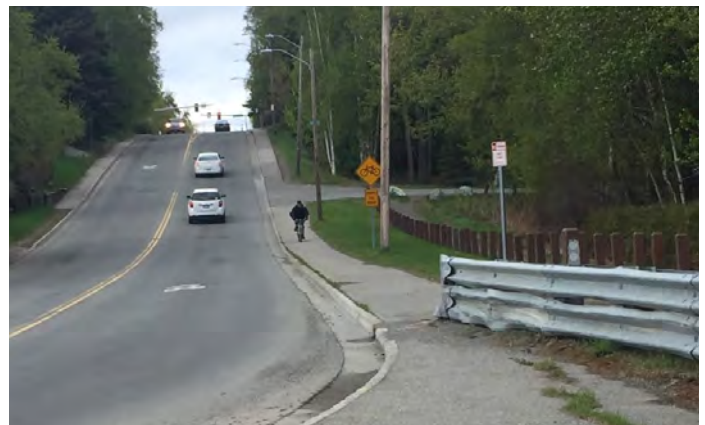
Active transportation shared street, Anchorage (May, 2019)
